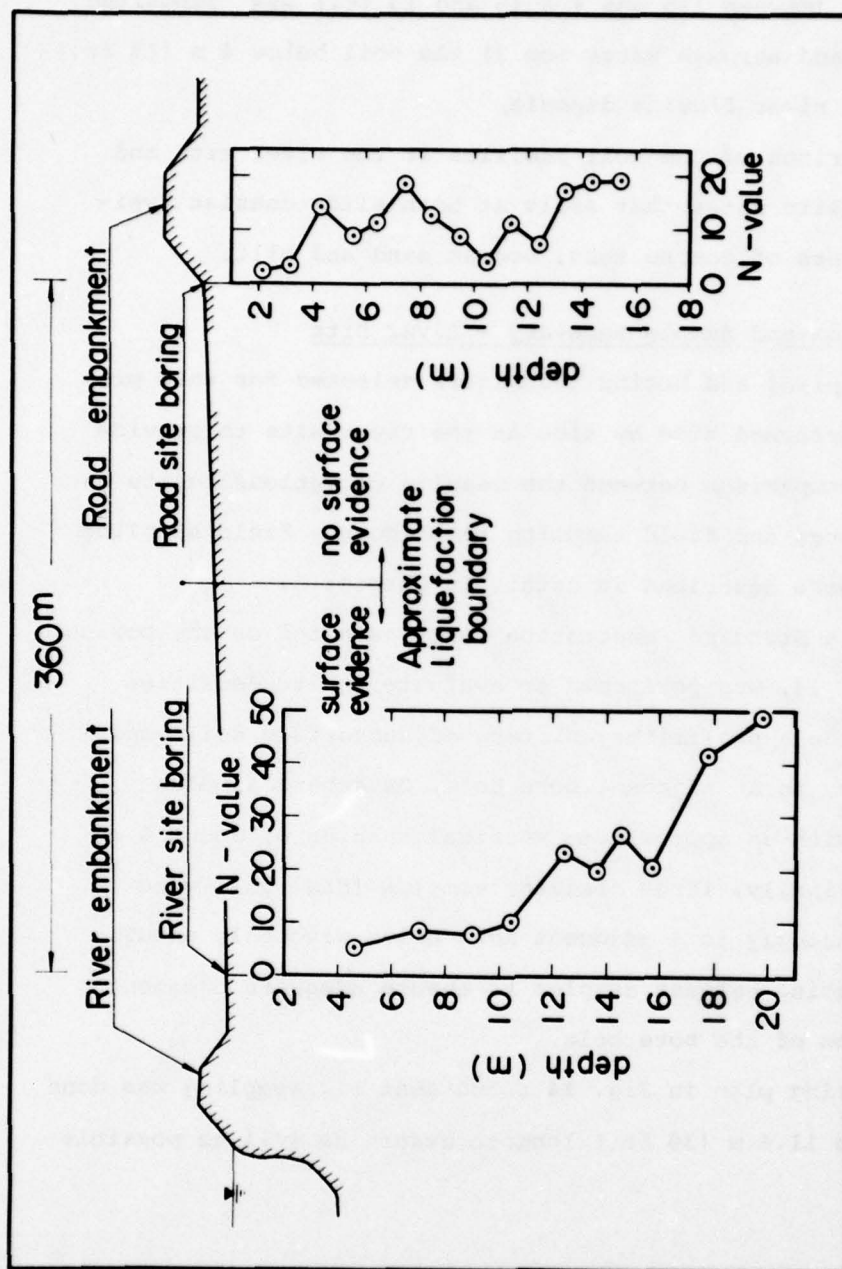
Cross-Section between River and Road Boring Sites Niigata, Japan.
